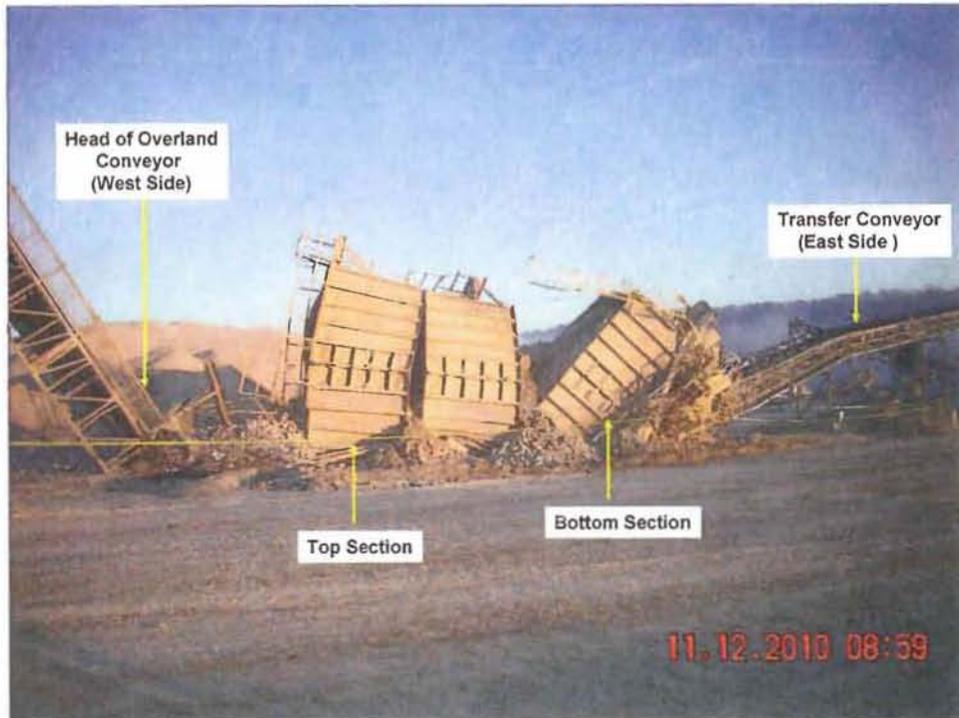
South side of Surge Bin Tower with respect to looking north.
